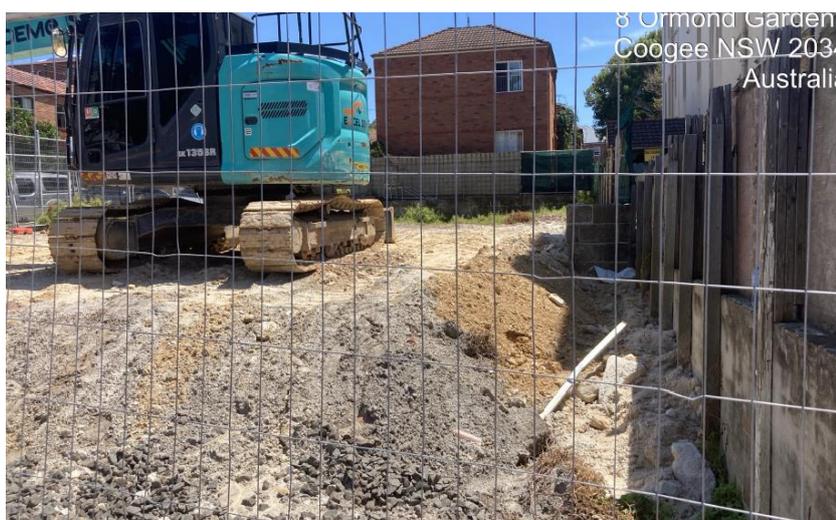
Photo of the subject site from Brook Street looking west (Source: Randwick City Council)
